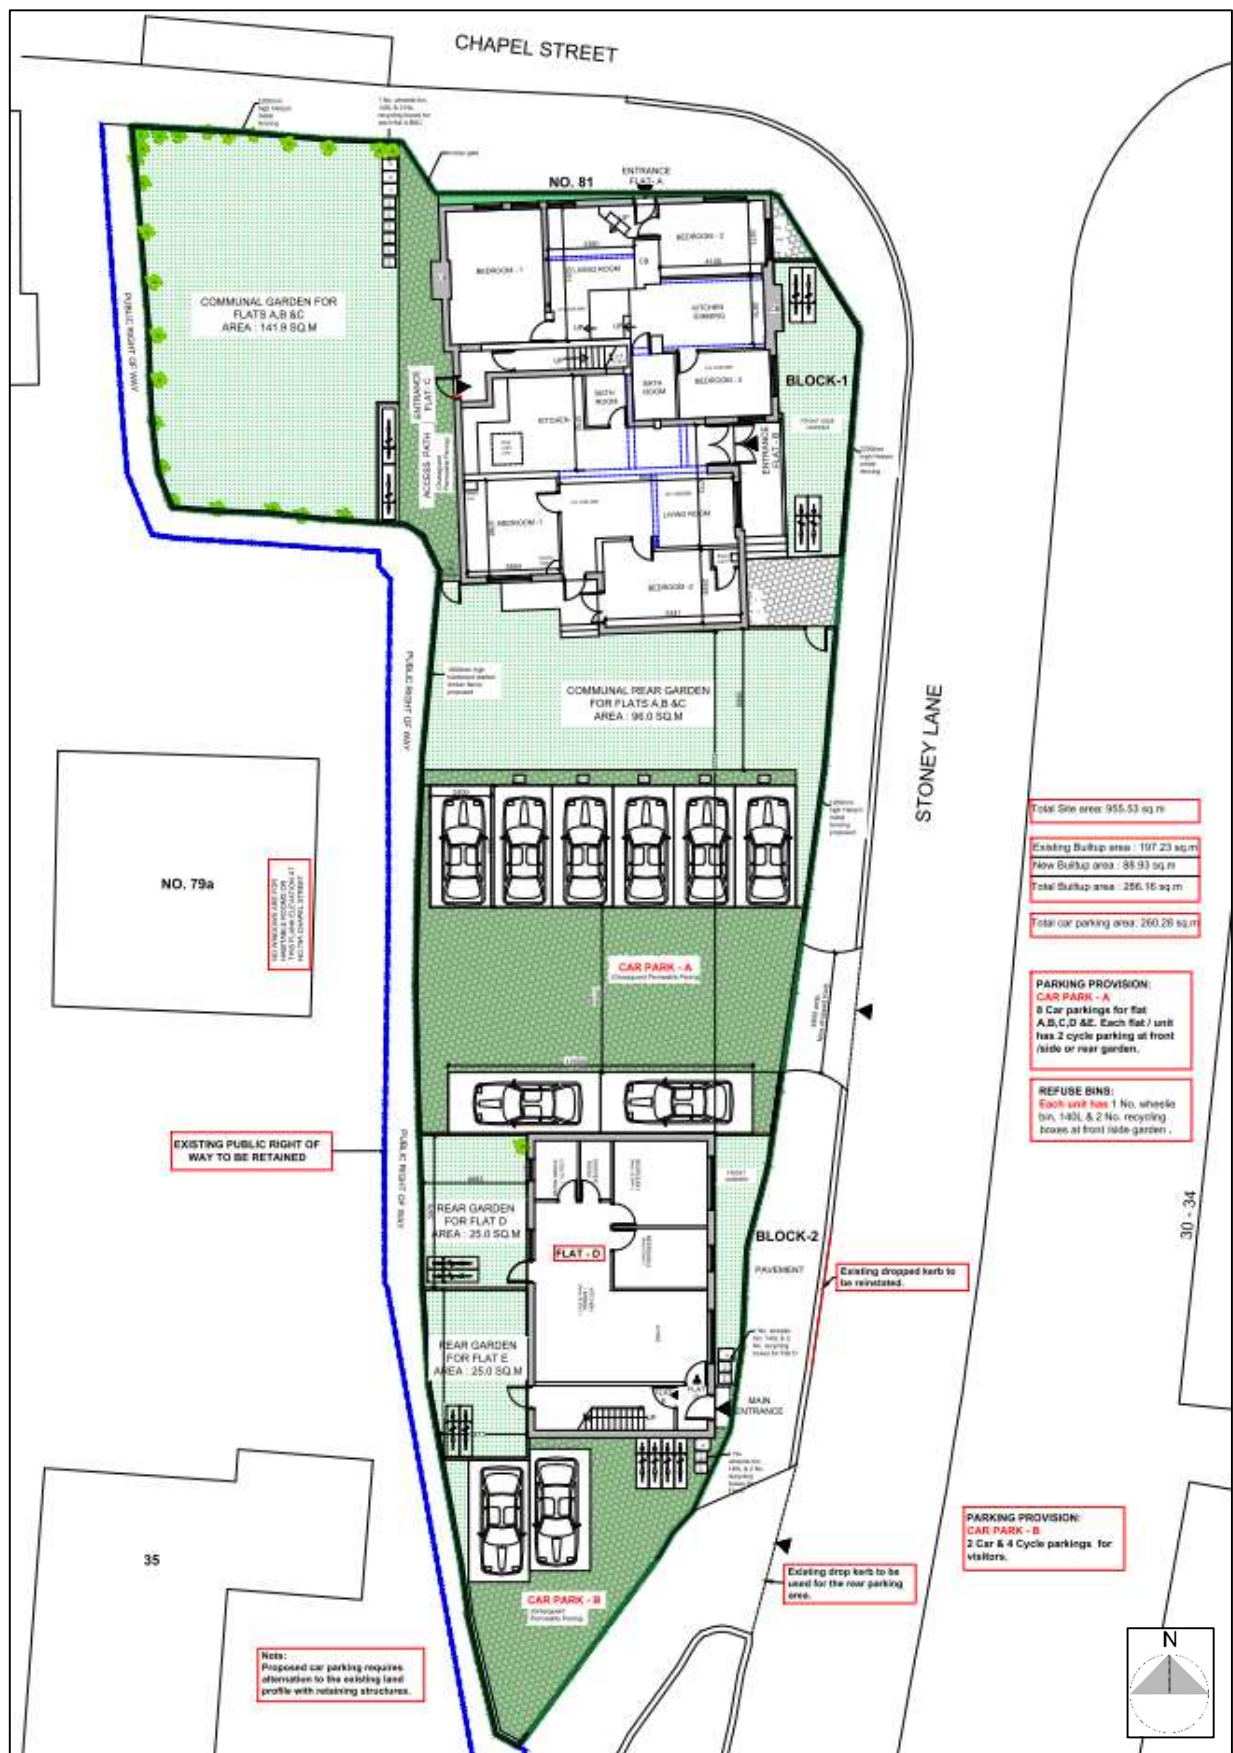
Proposed development site – ground floor plan (Image Reference: Surveying and Design Services Ltd)
